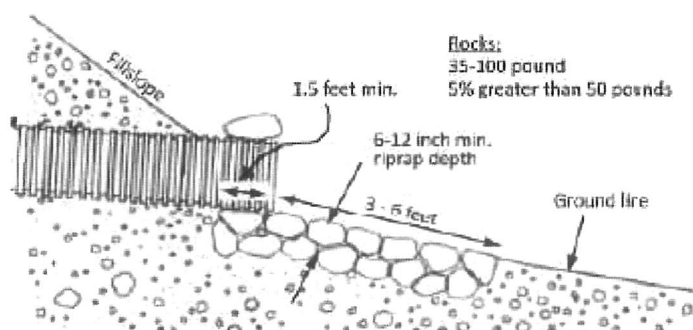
A. Riprap armor at culvert outlet (Modified from: Keller et al., 2011).
